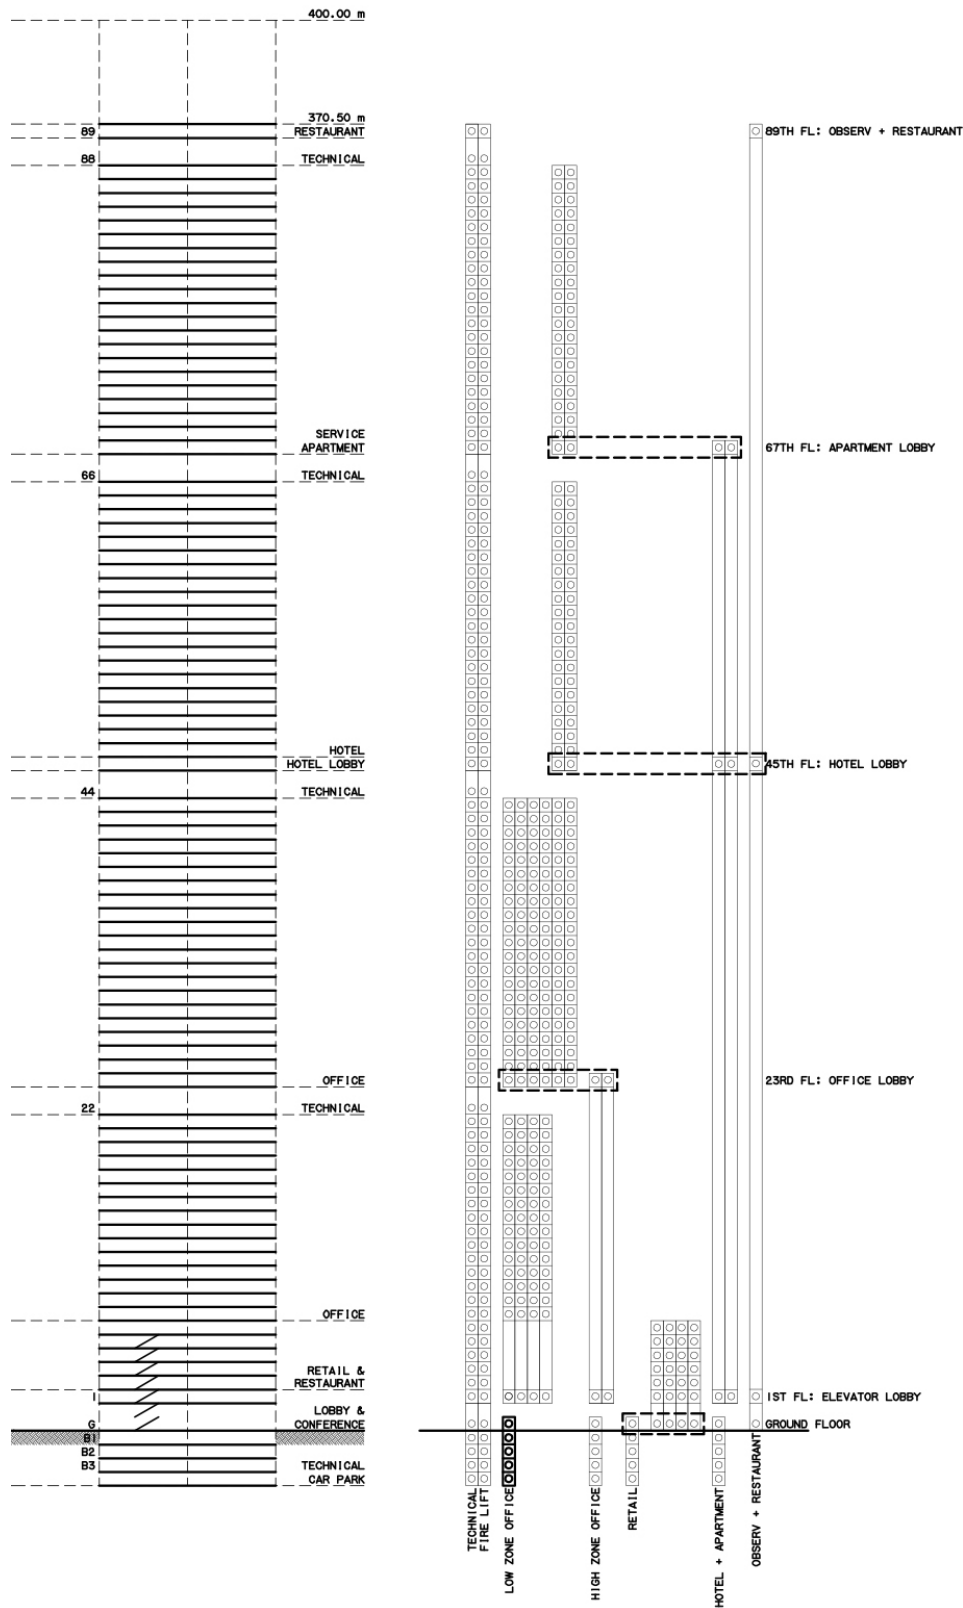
Example building draft section and elevators planning. The building is 370.50 m height with 89 stories, 50x50m square shape floor plate.
